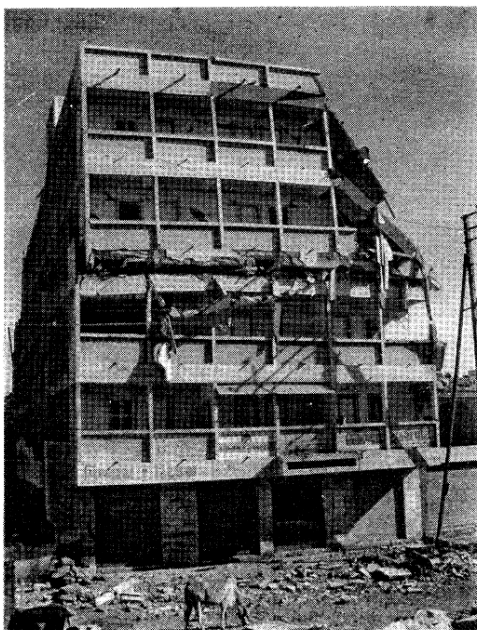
Intermediate storey collapse of a 6-storey building in Bhuj.
